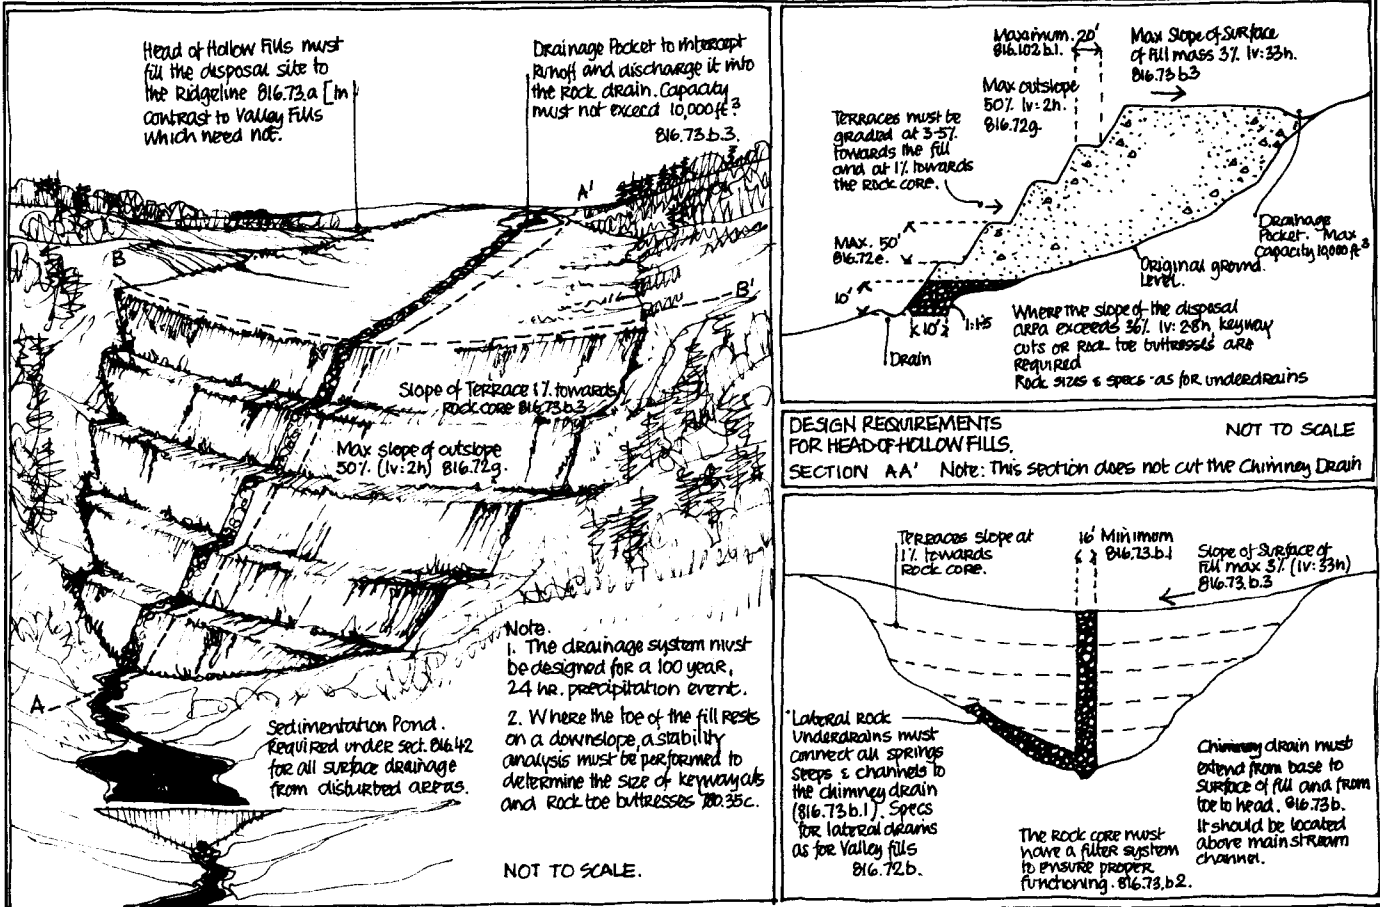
DESIGN REQUIREMENTS FOR HEAD-OF-HOLLOW FILLS Section 816.73. The surface of the fill and terraces should slope inwards to a central chimney drain. The fill must entirely fill the disposal area to the elevation of the low point of the ridge. 816.73.a.
